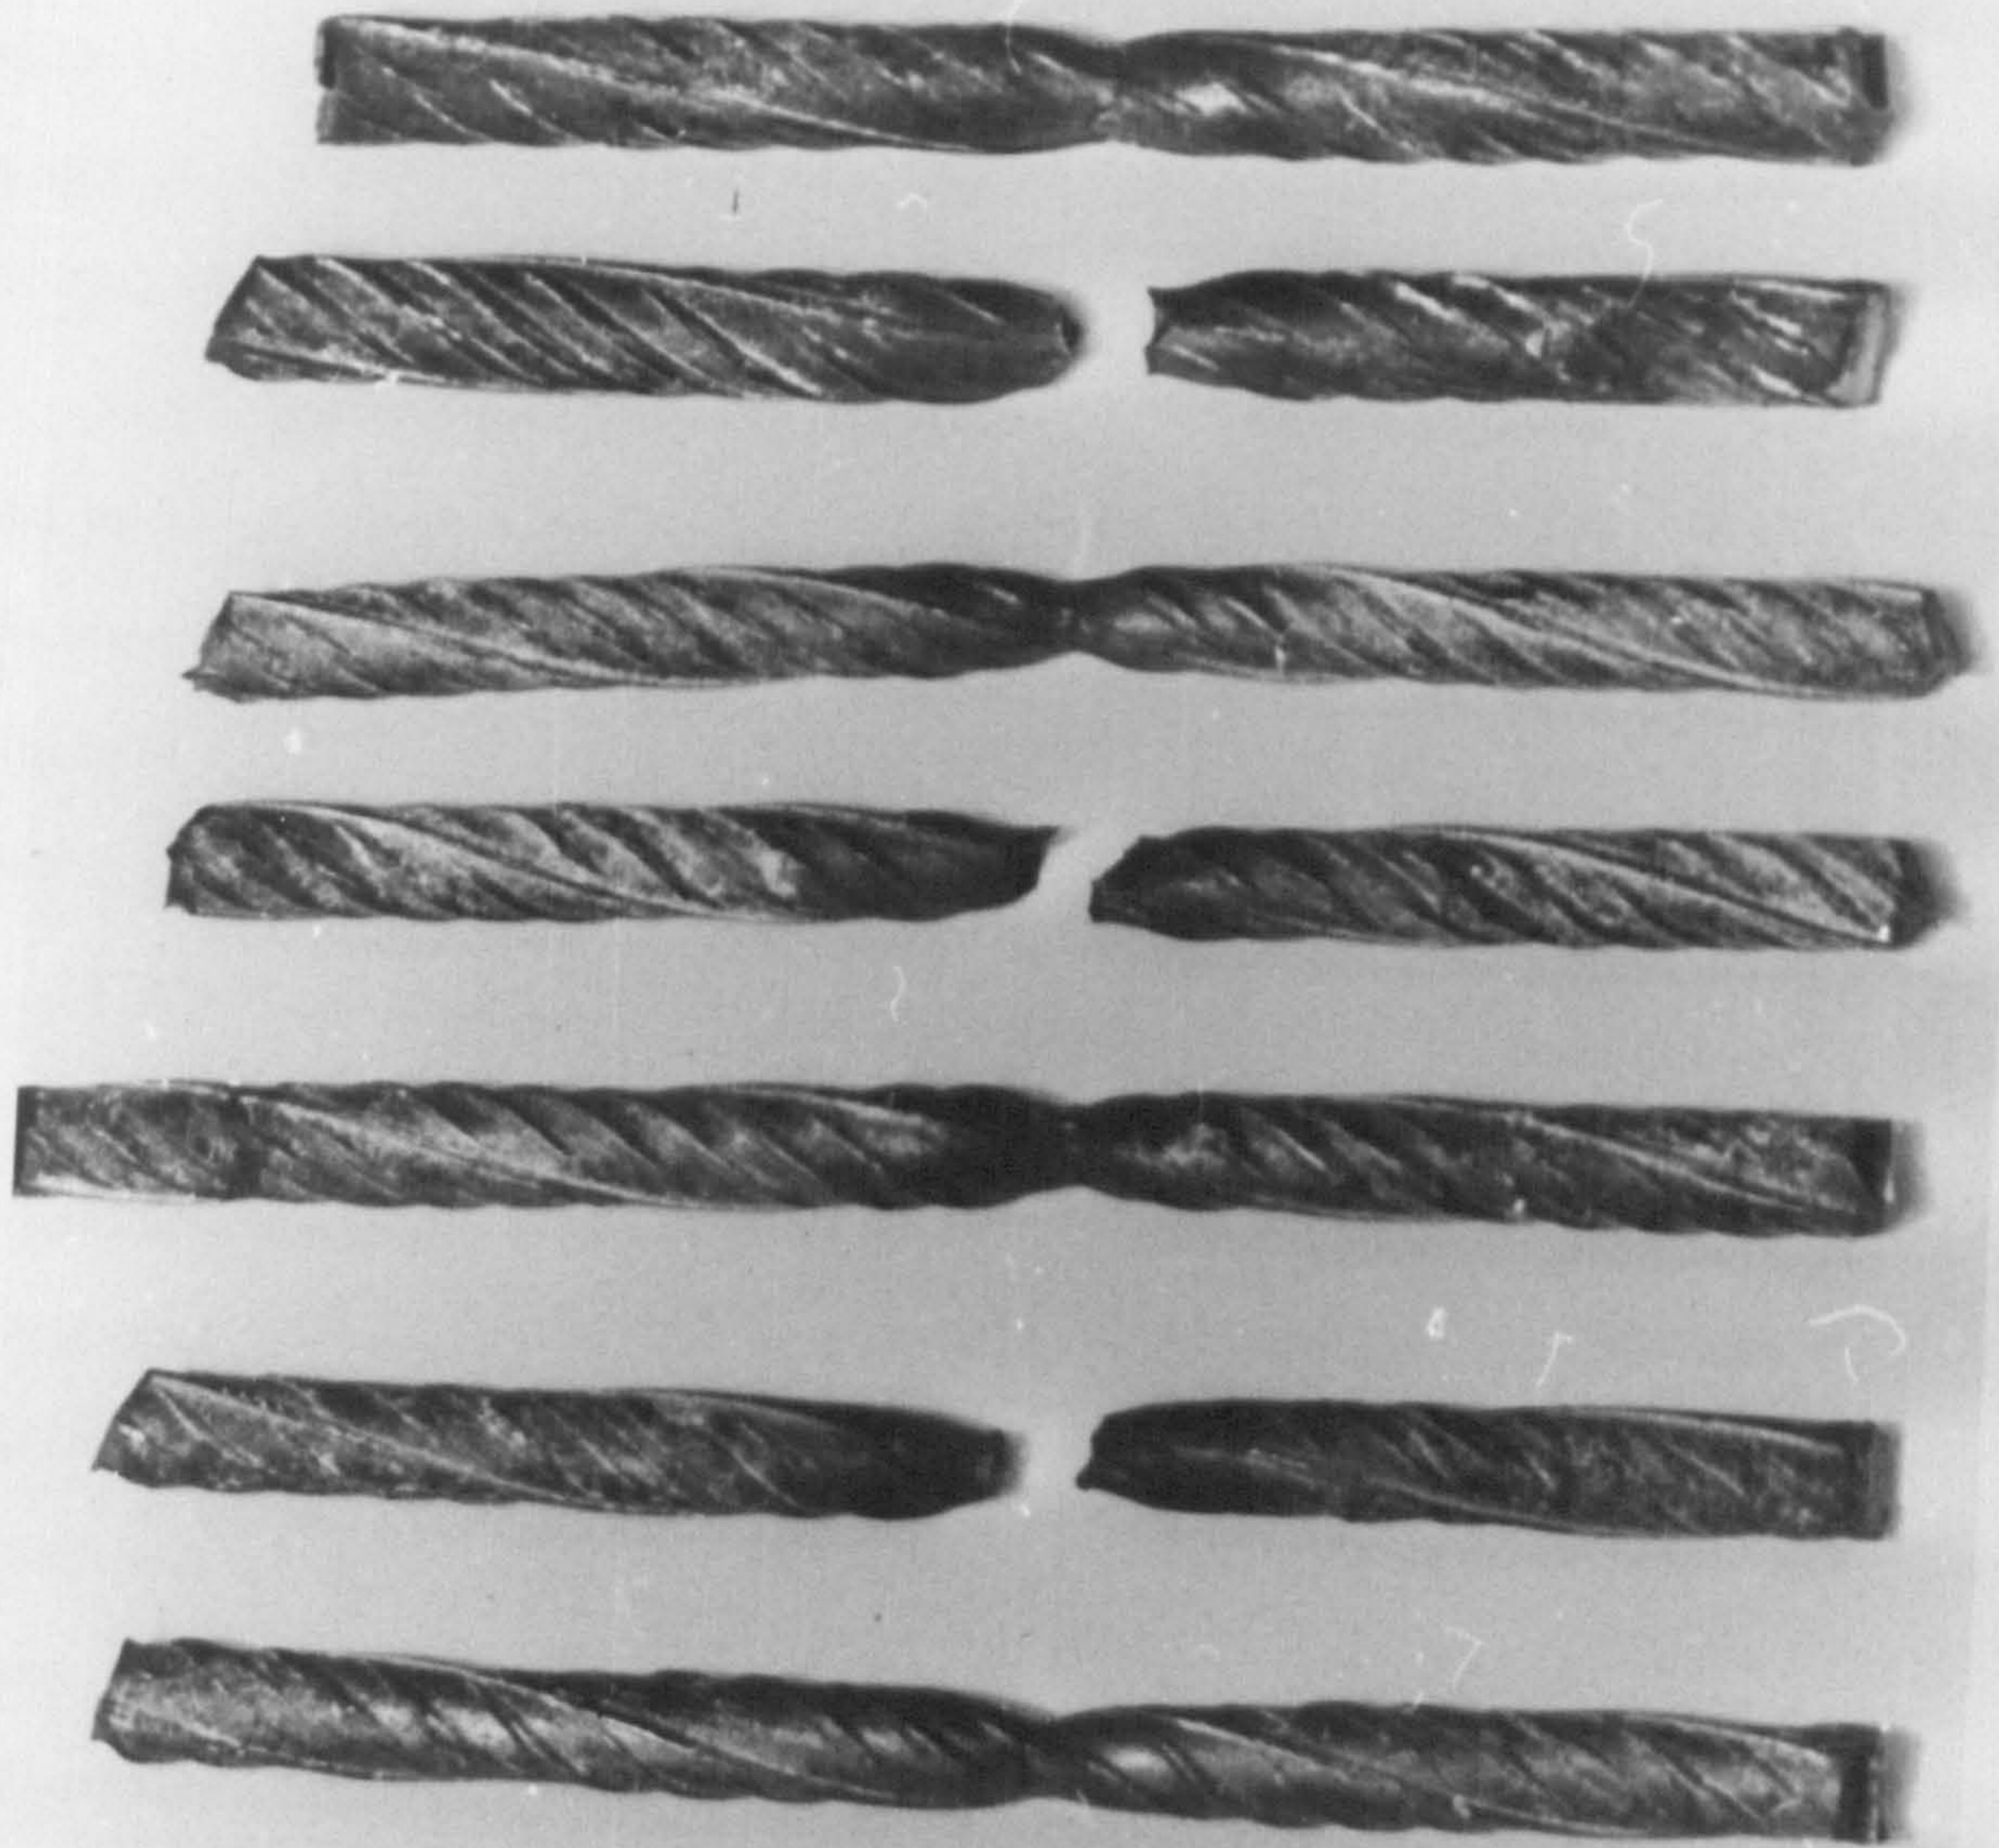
TENSILE STEEL SPECIMENS FROM FLEXURAL BEAMS
